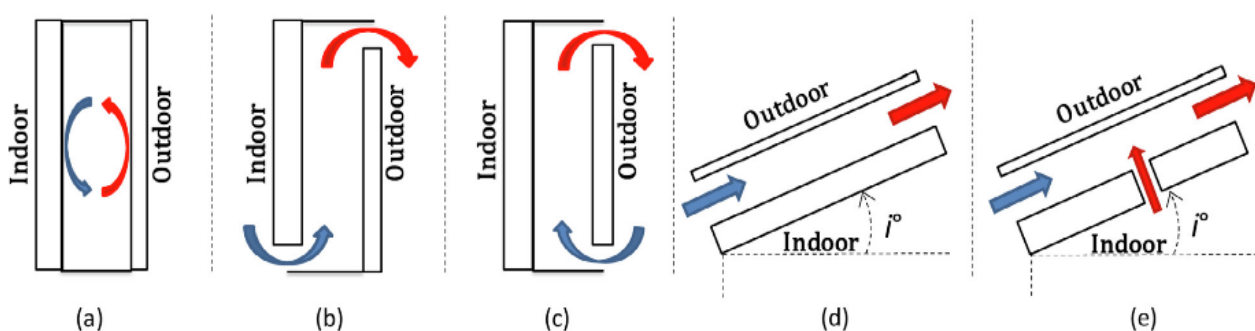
Typologies of ventilated envelope surfaces: (a) closed cavity façade; (b) exhaust air façade; (c) outdoor air curtain façade; (d) ventilated roof; (e) ventilated roof coupled to a natural ventilation of the building.
